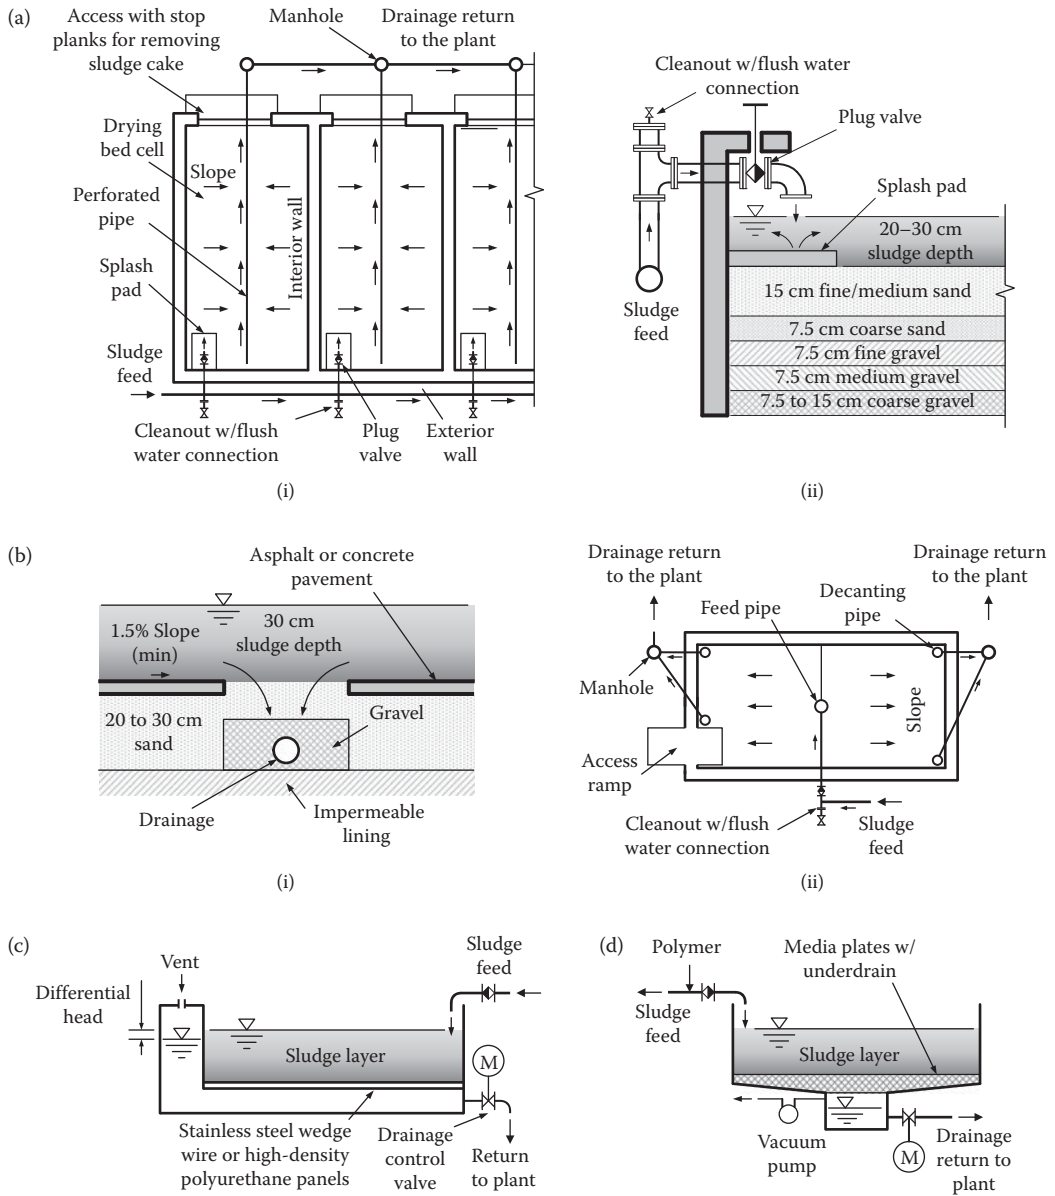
Sludge drying bed dewatering facilities: (a) conventional drying bed: (i) conceptual layout plan and (ii) typical section at sludge feed; (b) paved drying bed: (i) construction of drainage type bed and (ii) conceptual layout of decanting type bed; (c) the components of artificial-media drying bed; and (d) the components of vacuum assisted drying bed.
